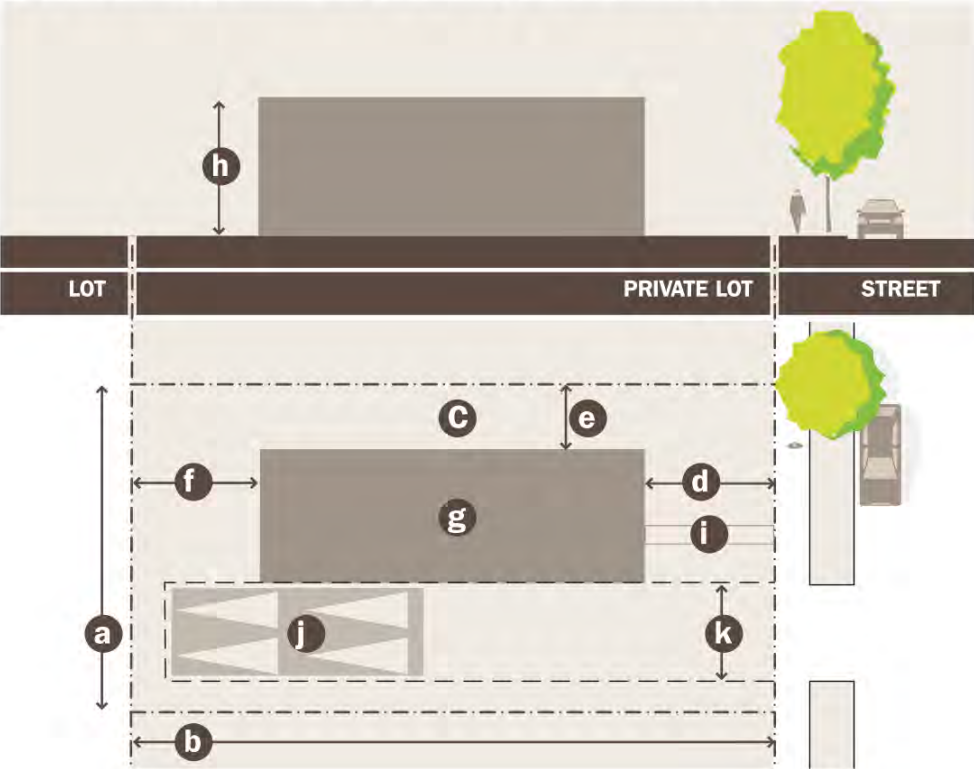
Detached Single Dwelling on Lot without a Lane
